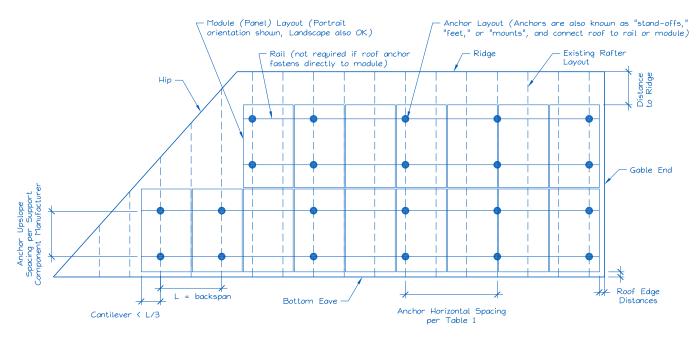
Sample Solar Panel Array and Anchor Layout Diagram (Roof Plan).
